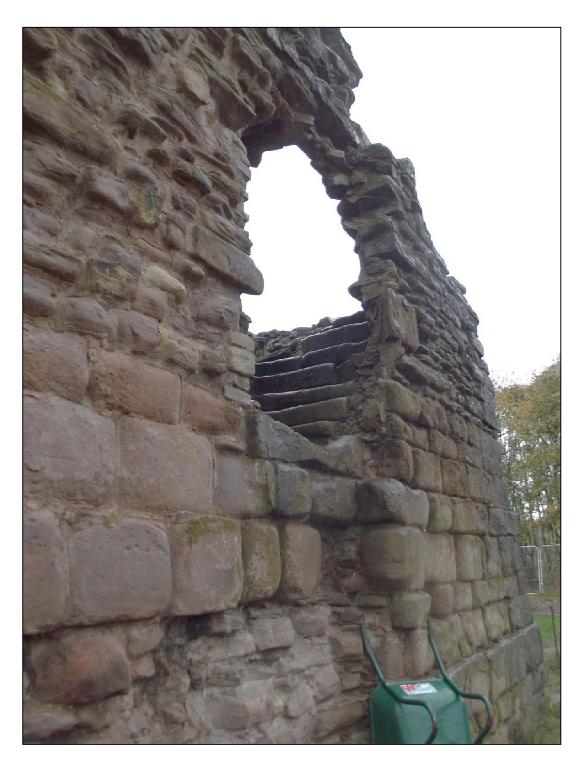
The first floor doorway to the tower in the western elevation. Note the surviving stairs.
